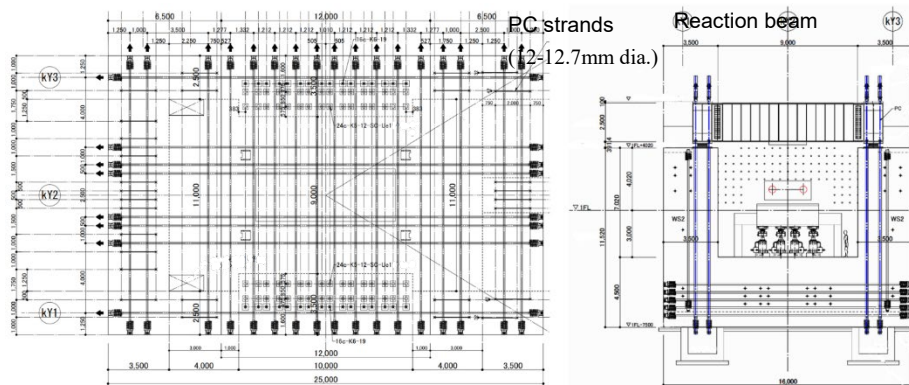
Plan and section of RC reaction wall with PC strand arrangement (Courtesy of Kurosawa Kensetsu)
